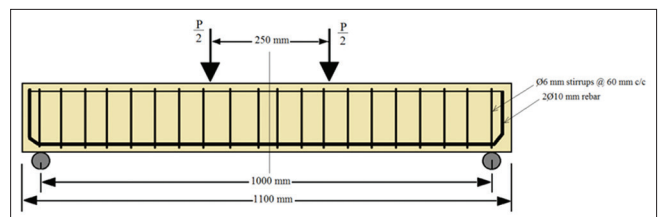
Loading arrangement, dimensions, and reinforcement details of beams
